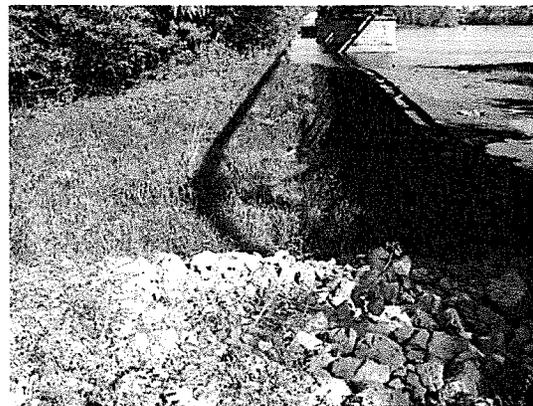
Under the bridge. Note the bare area directly under the bridge, due to shade.
